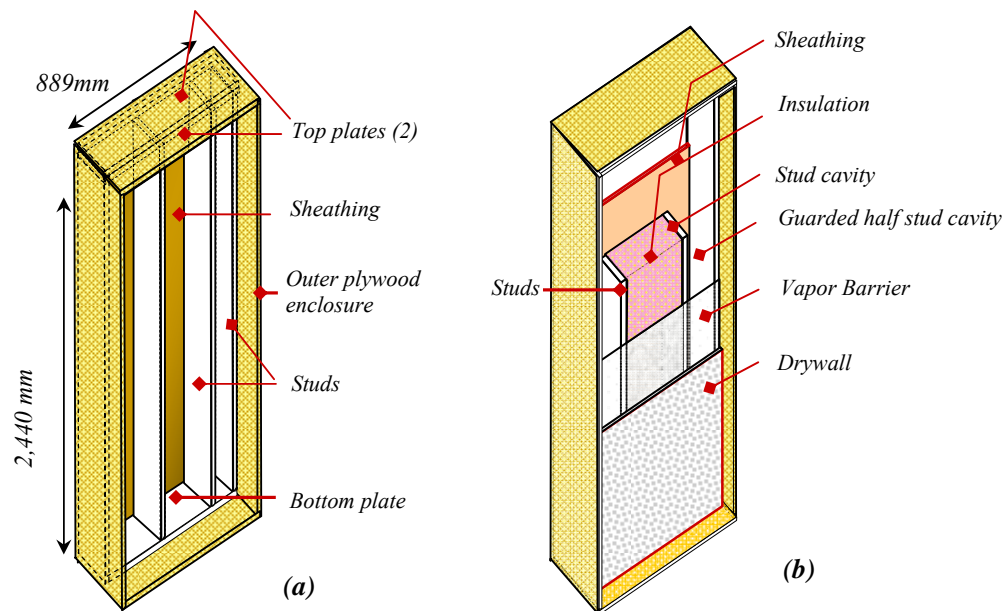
Isometric view of a specimen (a) specimen frame, (b) components of a specimen
